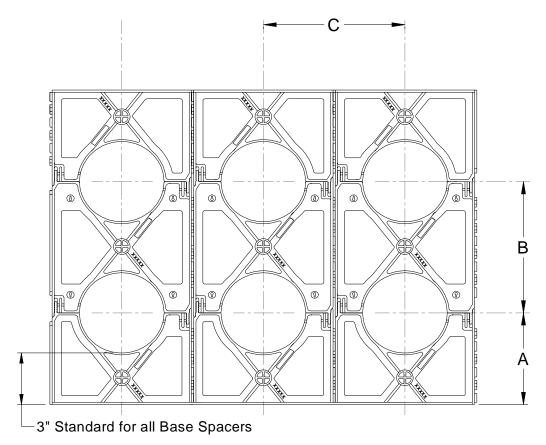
FIGURE A - PLAN VIEW TYPICAL DISTRIBUTION CONDUIT CONSTRUCTION DETAILS
